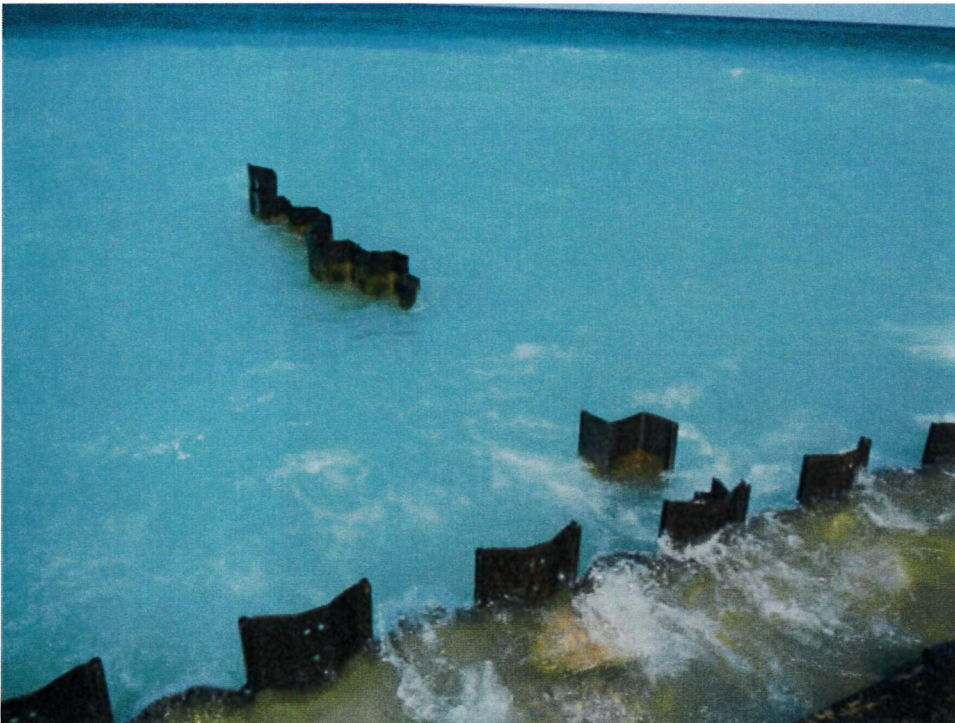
Groin 3 (looking west). Separation between wall and groin. Several sheet piles appear to be missing.
